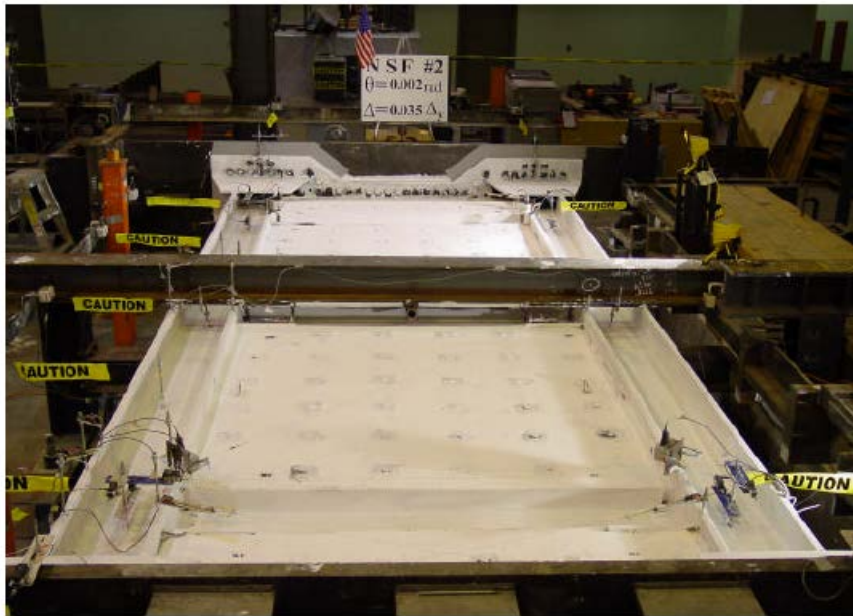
Composite Plate Shear wall specimen (Zhao and Astaneh-Asl 2004)
